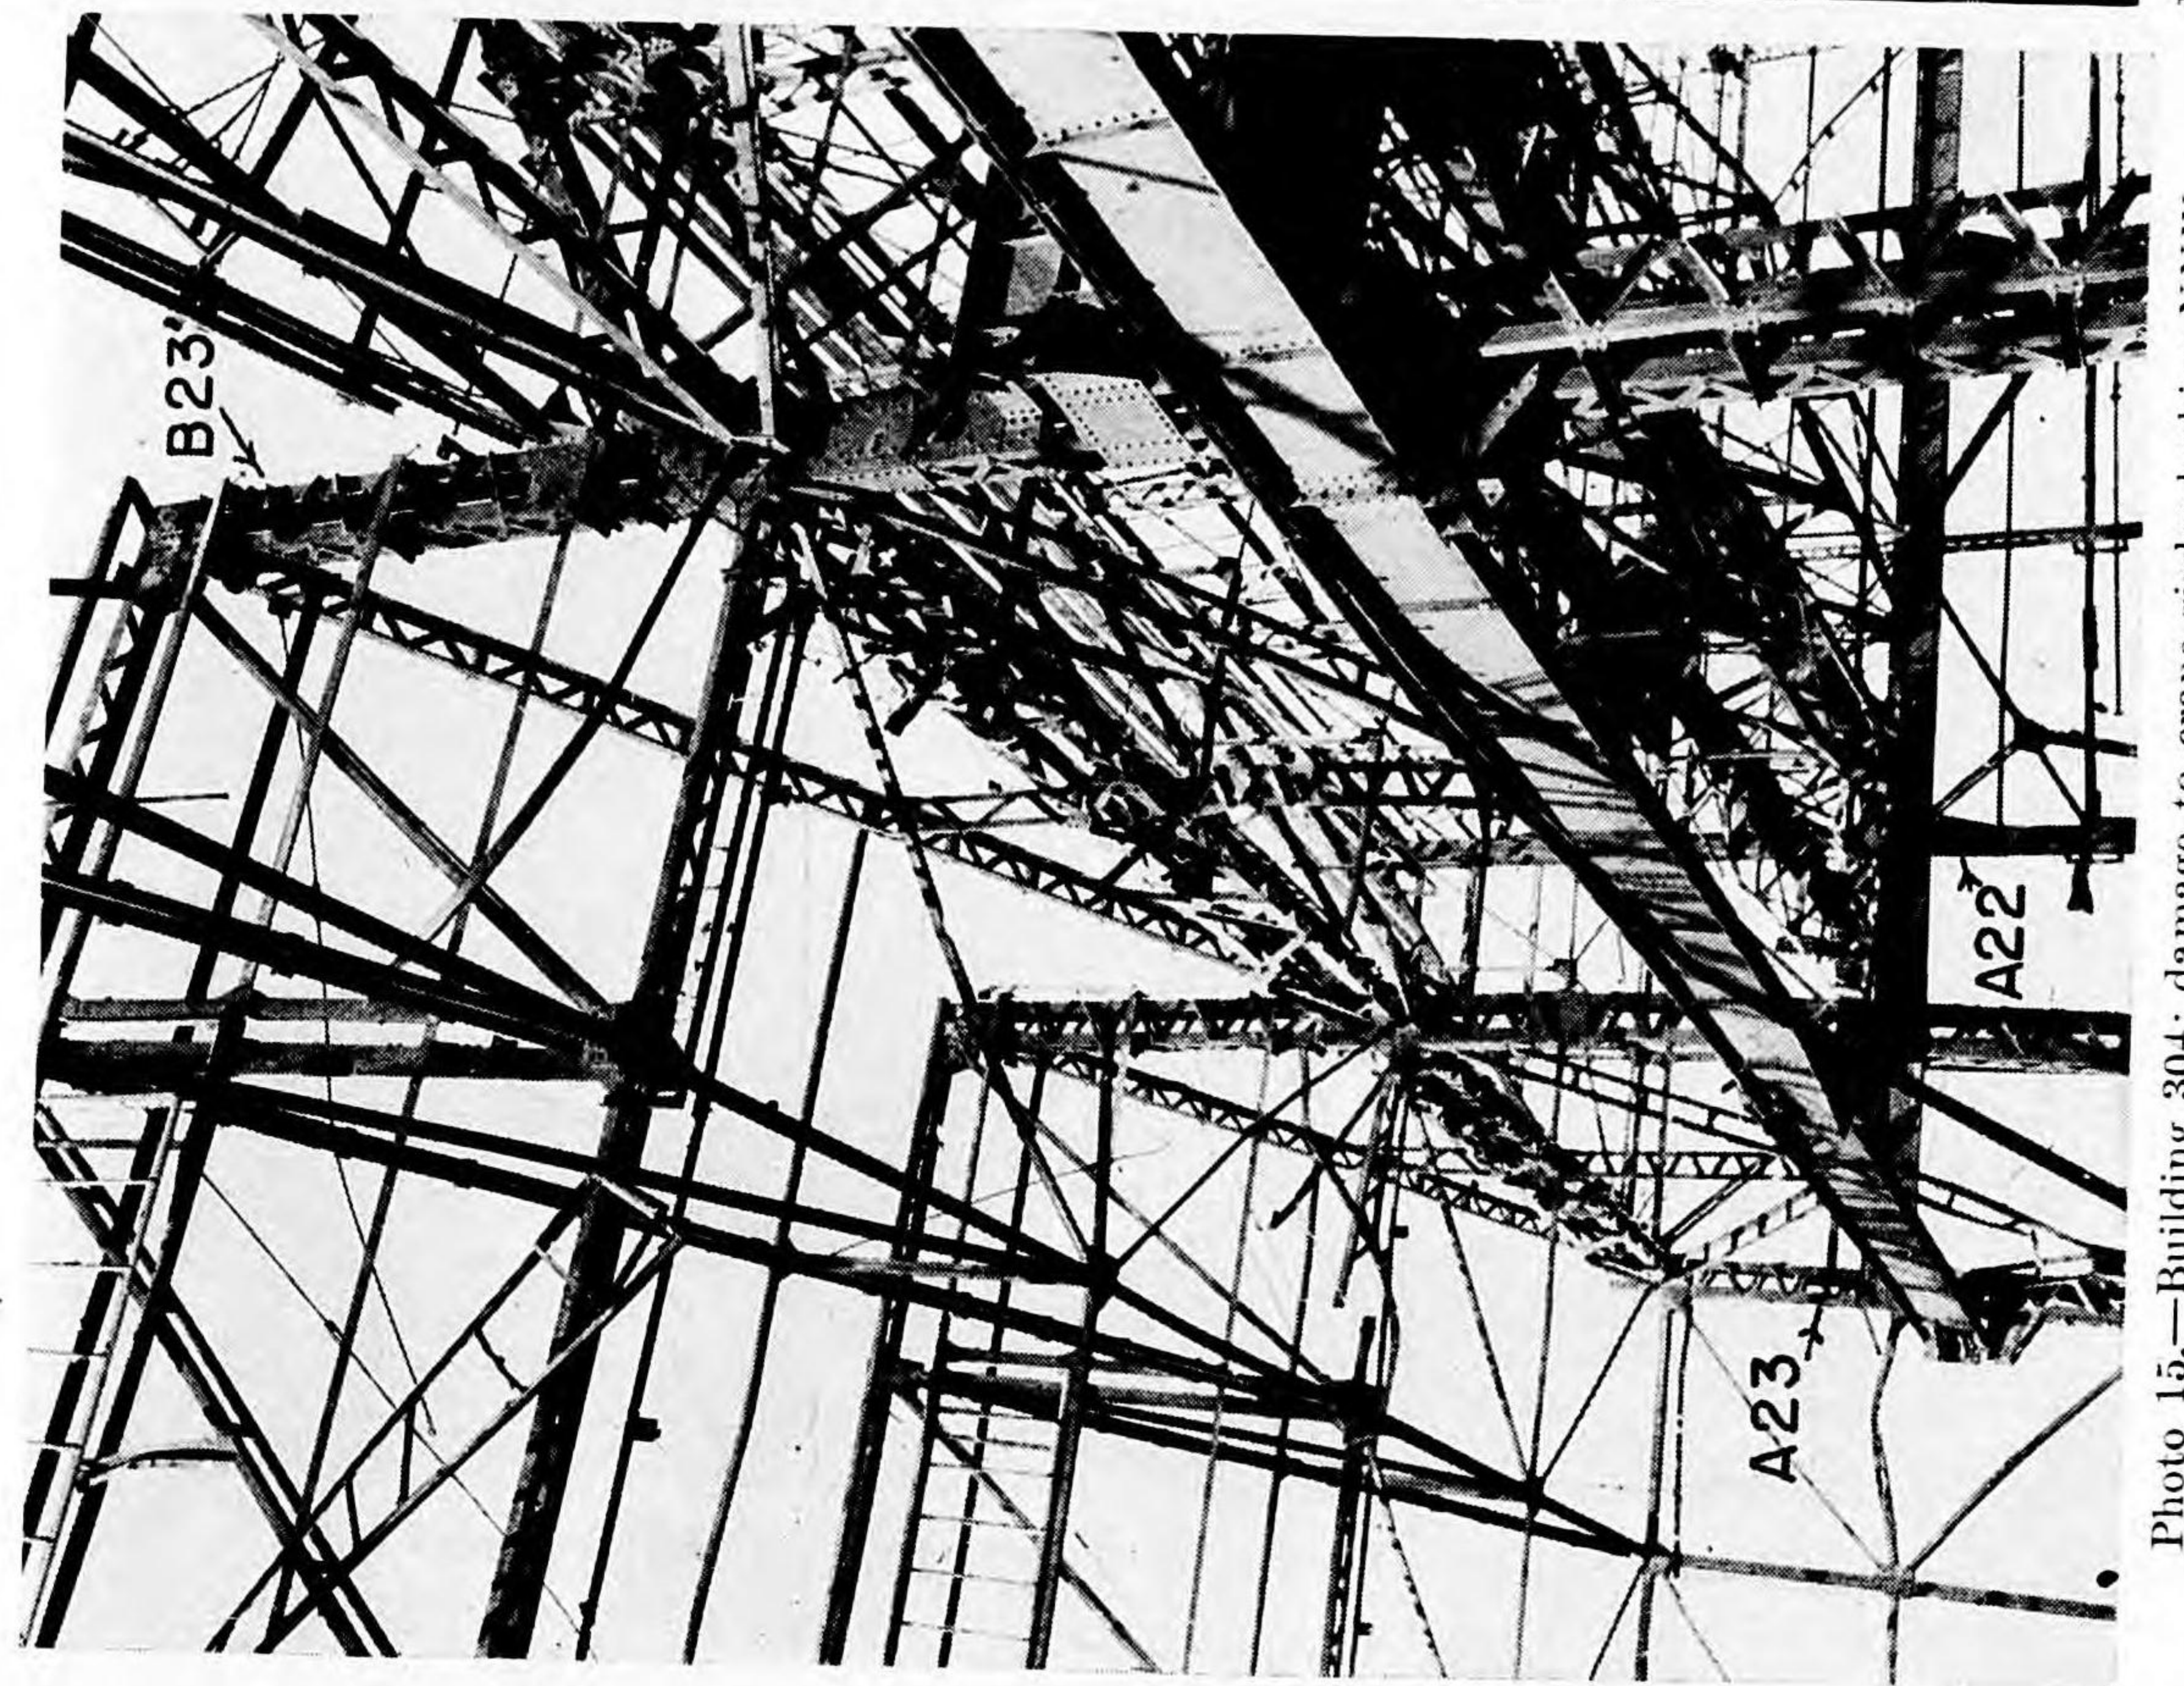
Building 304; damage to crane girder looking NNW.
